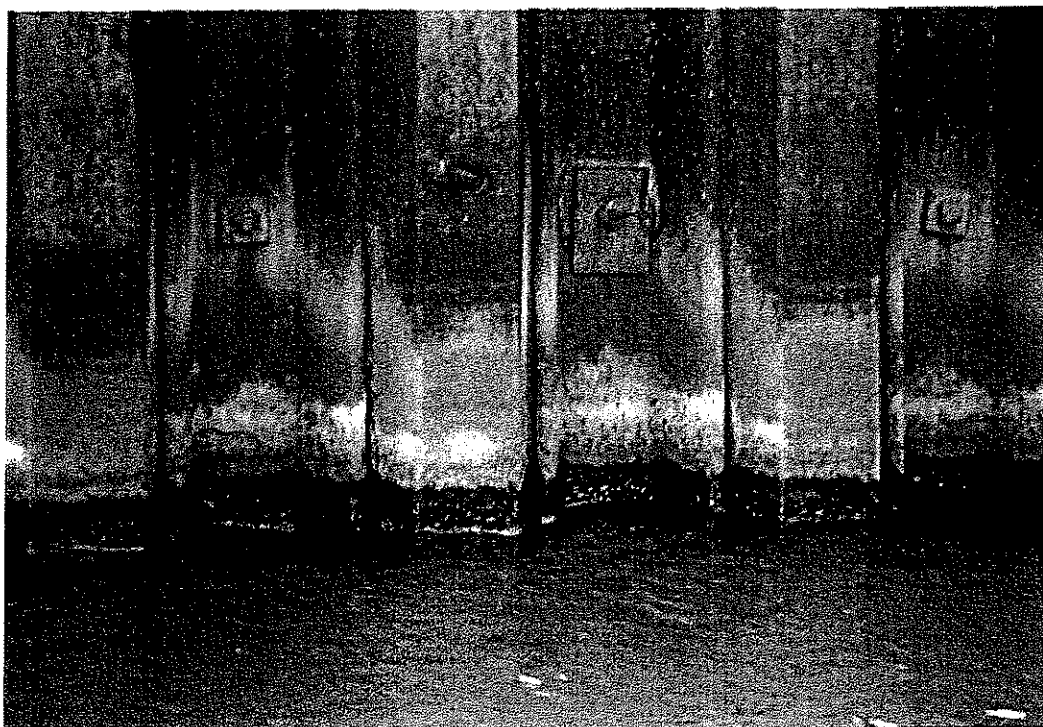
View of Typical Dockwall Configuration, Looking Northeast from Station 3+00.
